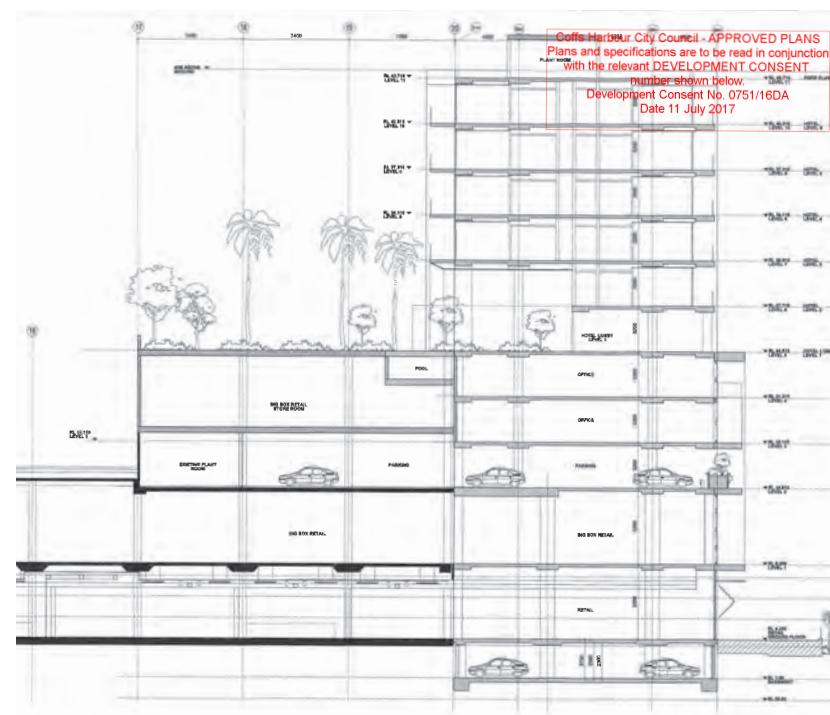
Section - Development application - Coffs Centre Shopping Centre extension (Source: DA 0751_16_Approved Plans)
